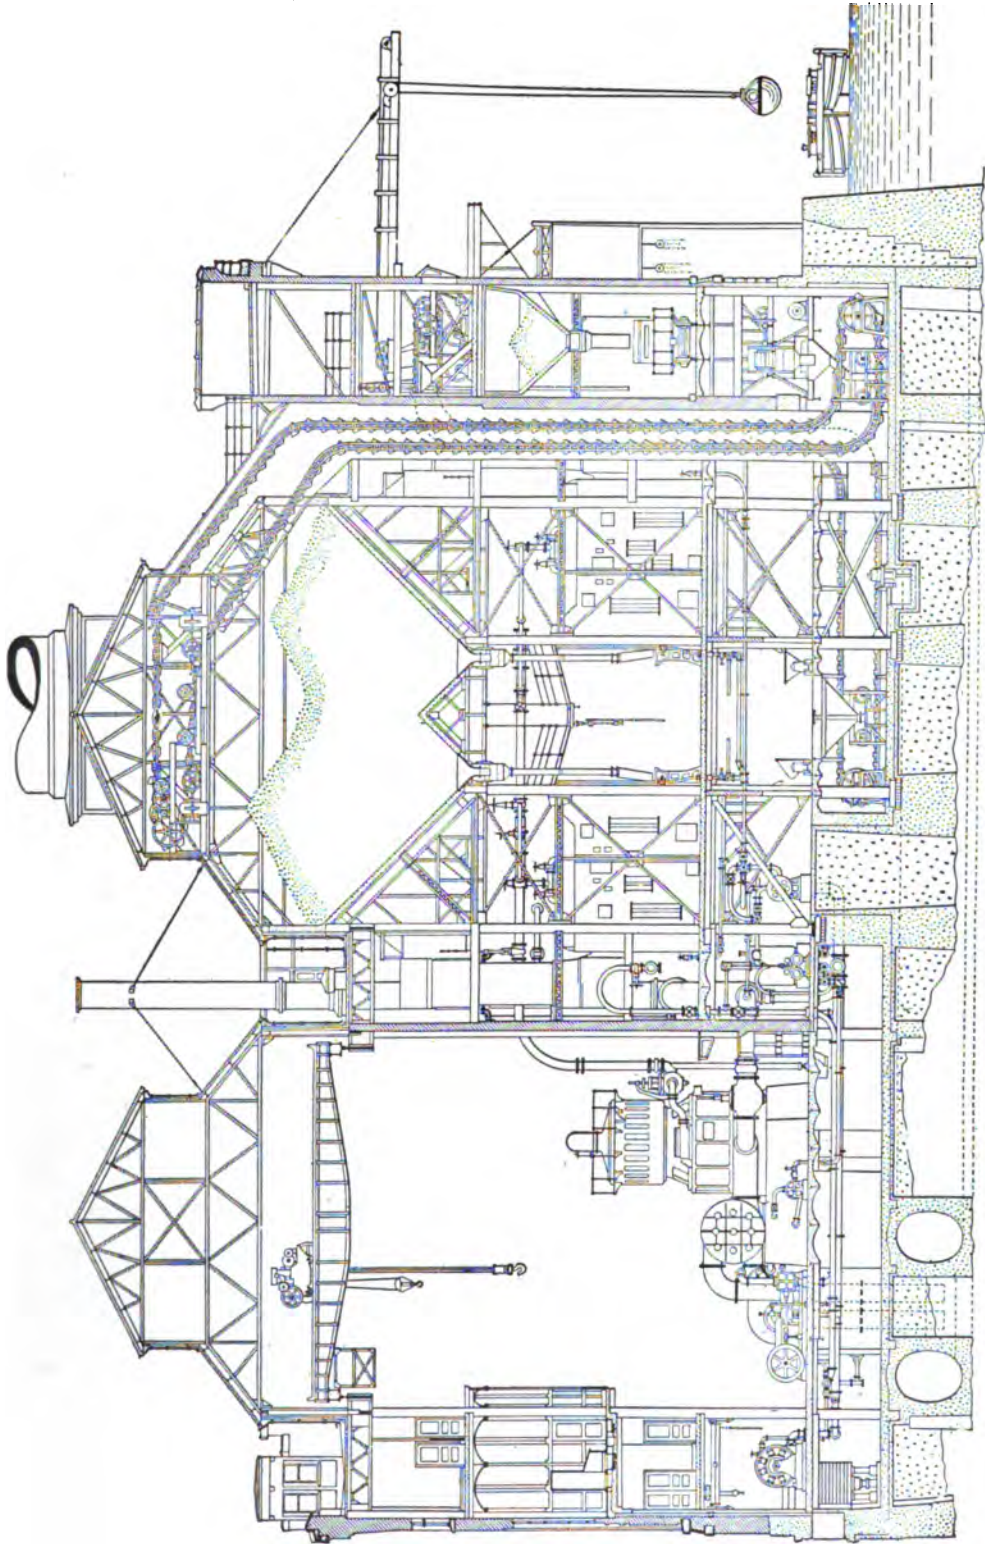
Cross-Section, Coal and Ash Handling System, Port Morris Plant, New York (*The Engineer*).
